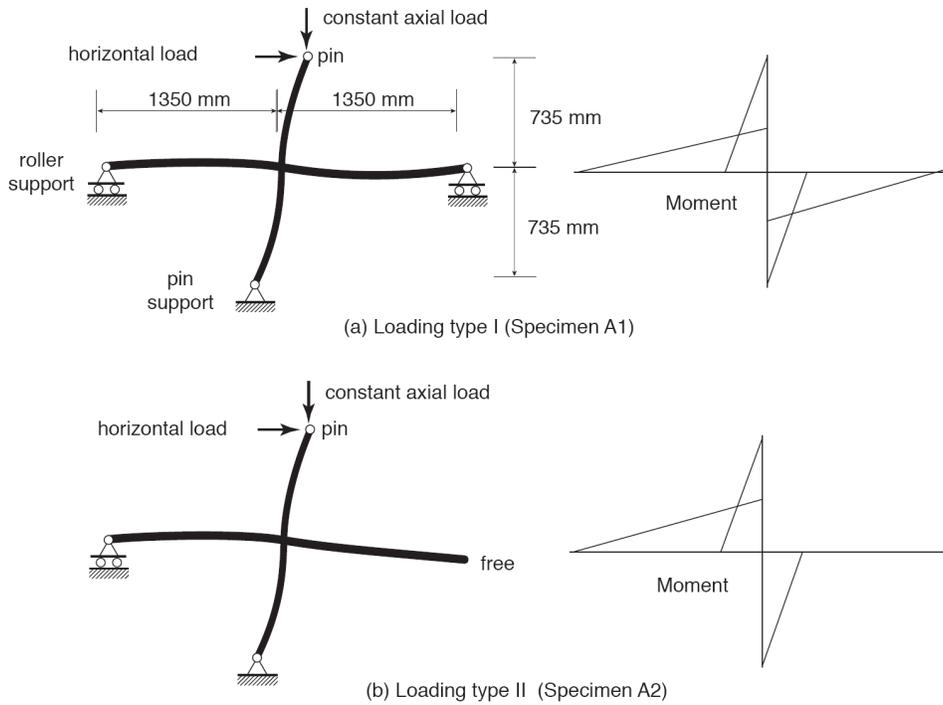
Loading and Boundary Conditions for Specimens A1 and A2
